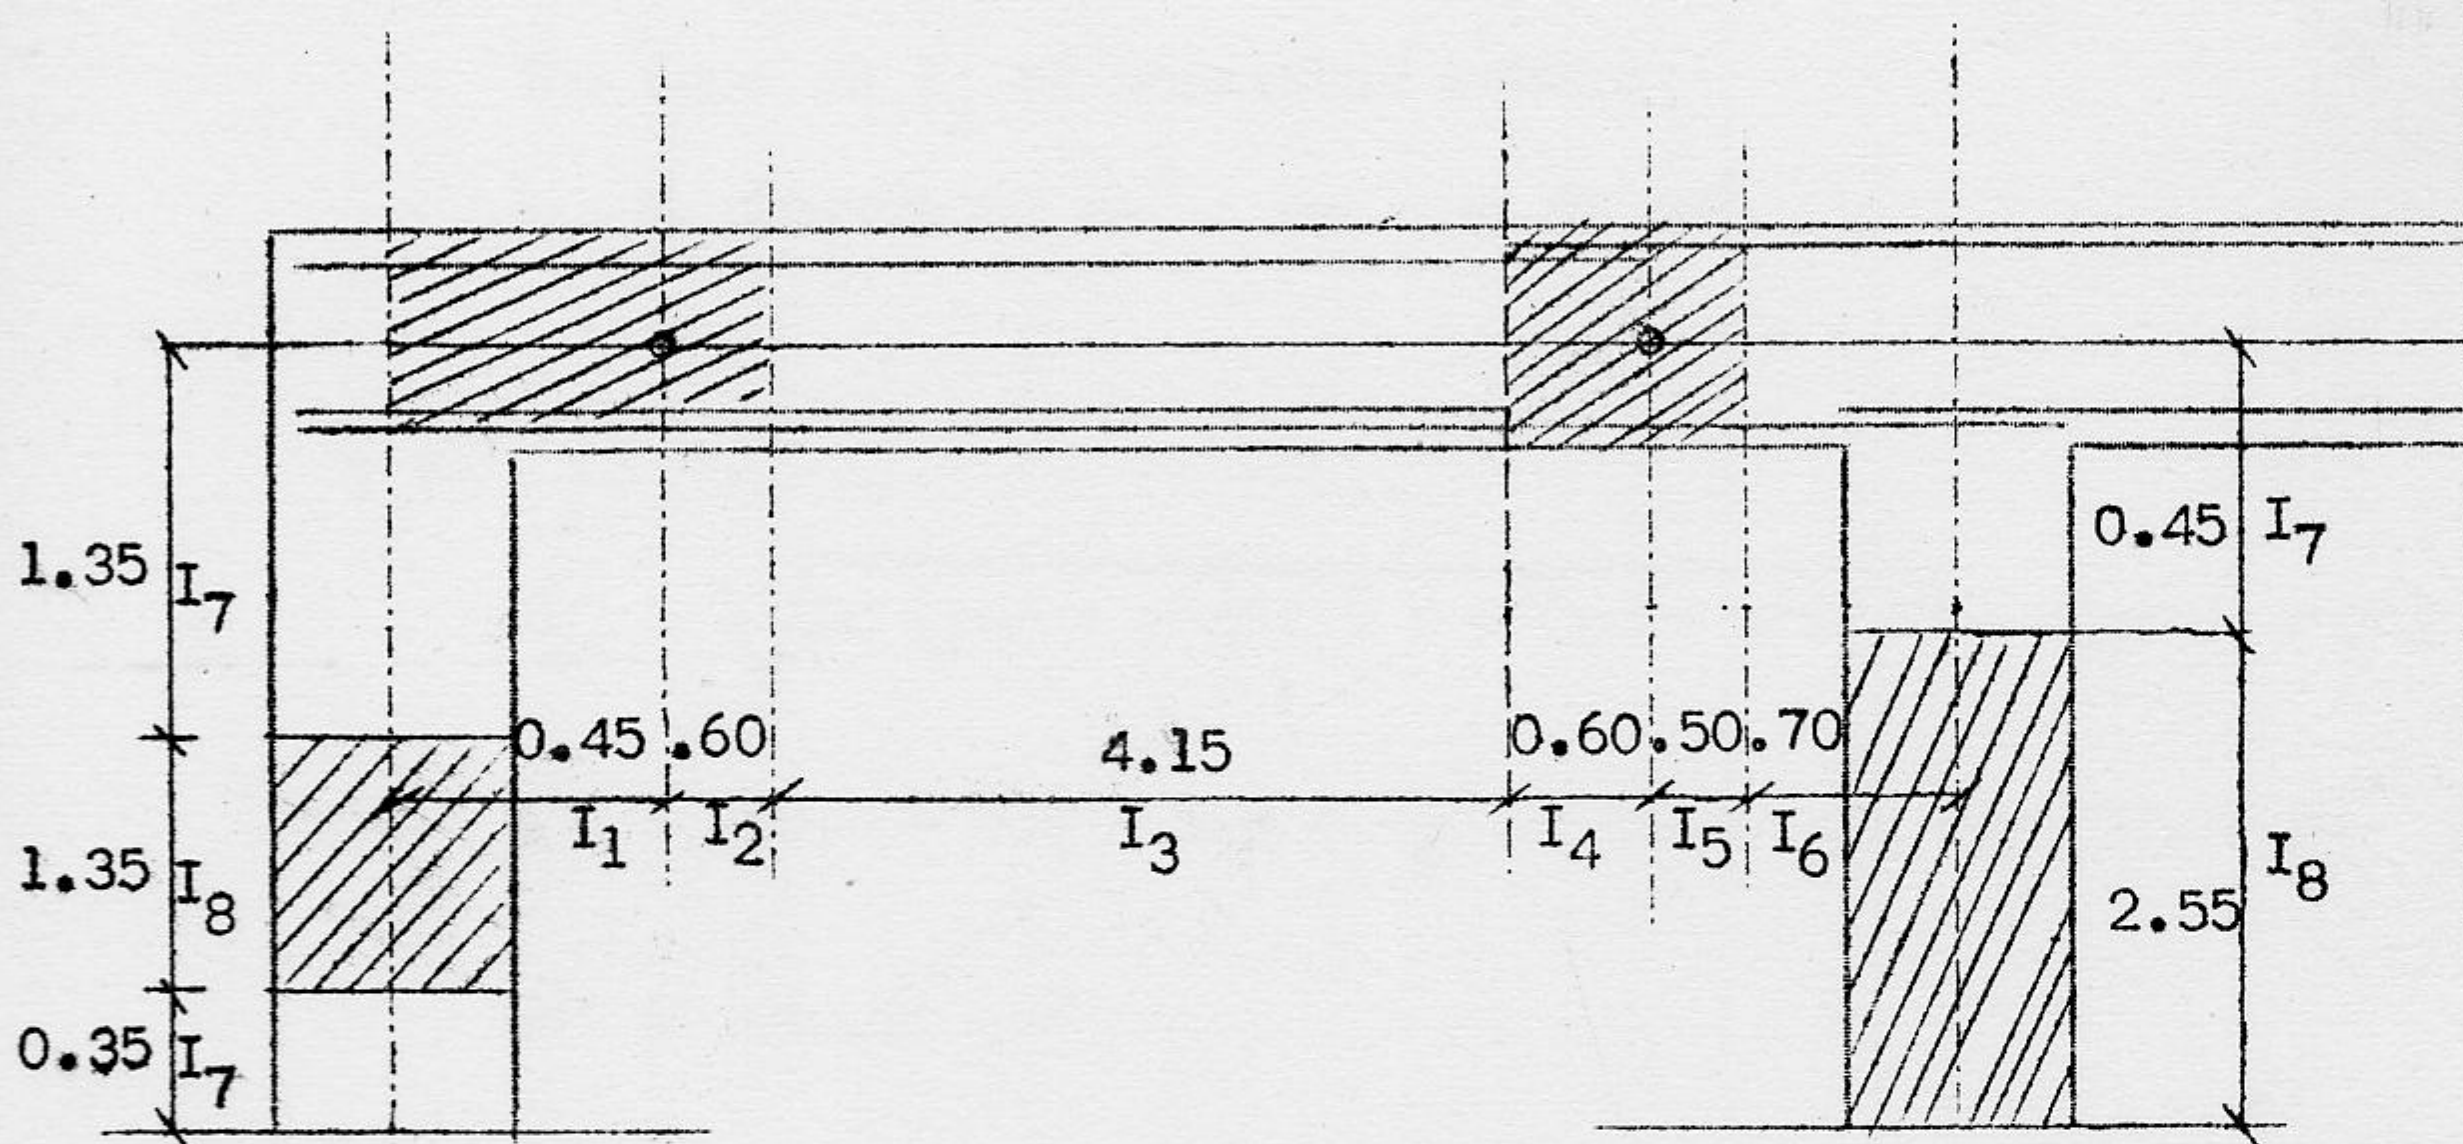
Cracked and uncracked sections of the frame (2nd stage of loading)
